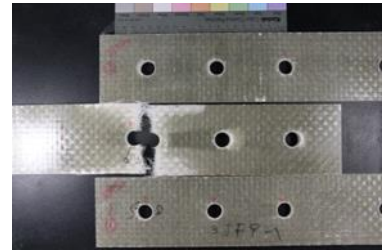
Failure mode of multi-row bolted connection with net-tension failure geometric parameters
